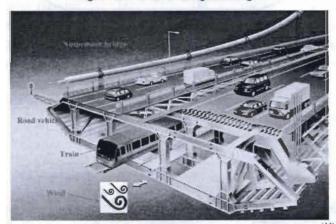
Tsing Ma bridge under railway, highway and wind loading(14).
